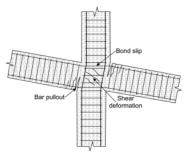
Deformed reinforced concrete (Altoontash, 2004)
